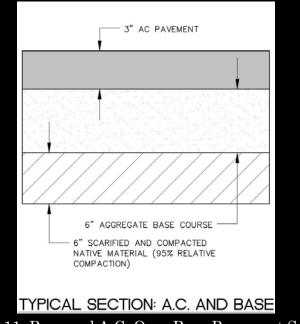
Proposed A.C. Over Base Pavement Section Drawing by: Trevor Snipes Table 3: Cost Breakdown for asphalt over 20 year span
